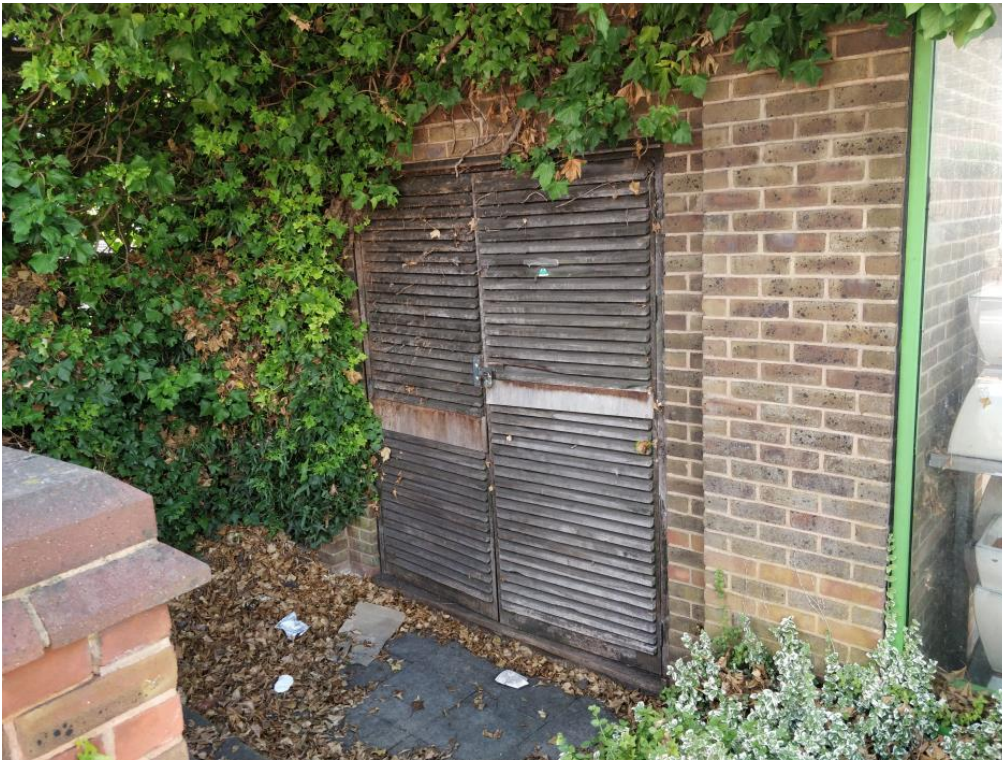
Brick structure assumed to be occupied by Southern Gas Network
